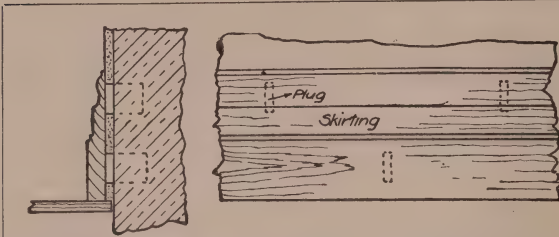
Section and Elevation of Skirting Board, etc., showing Method of Fixing
